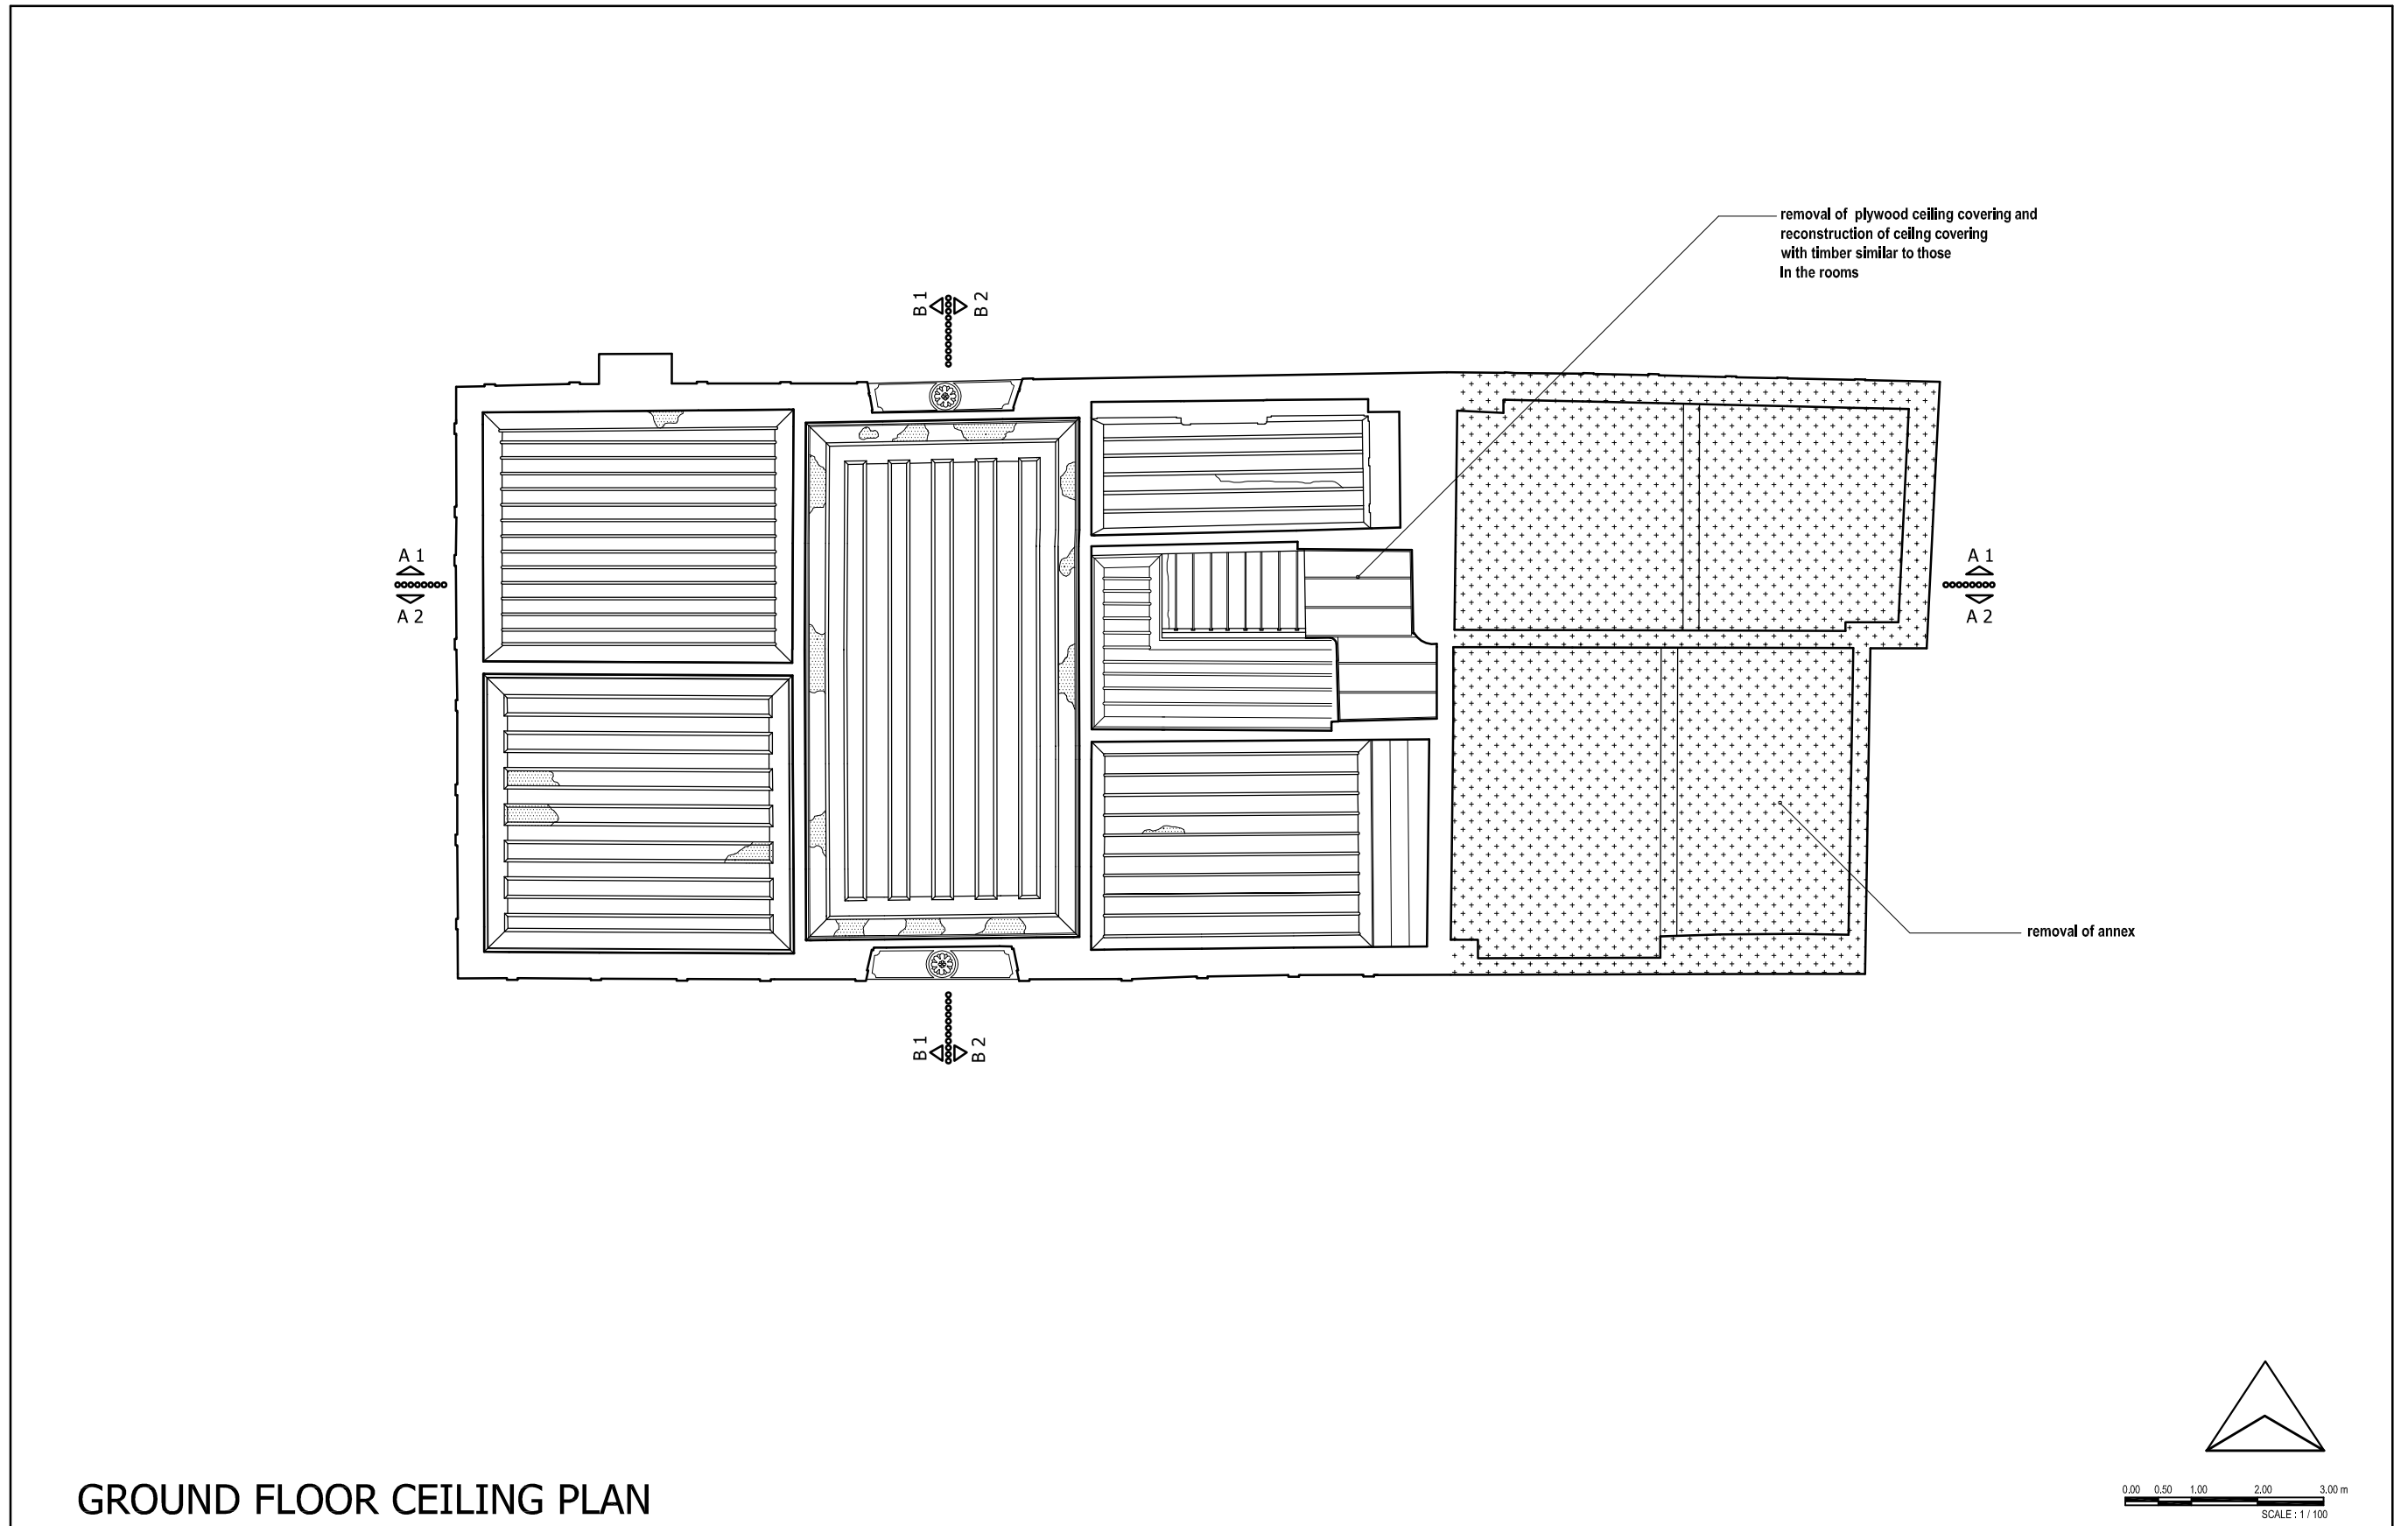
Measures for Ethics of Conservation- Ground Floor Ceiling Plan
